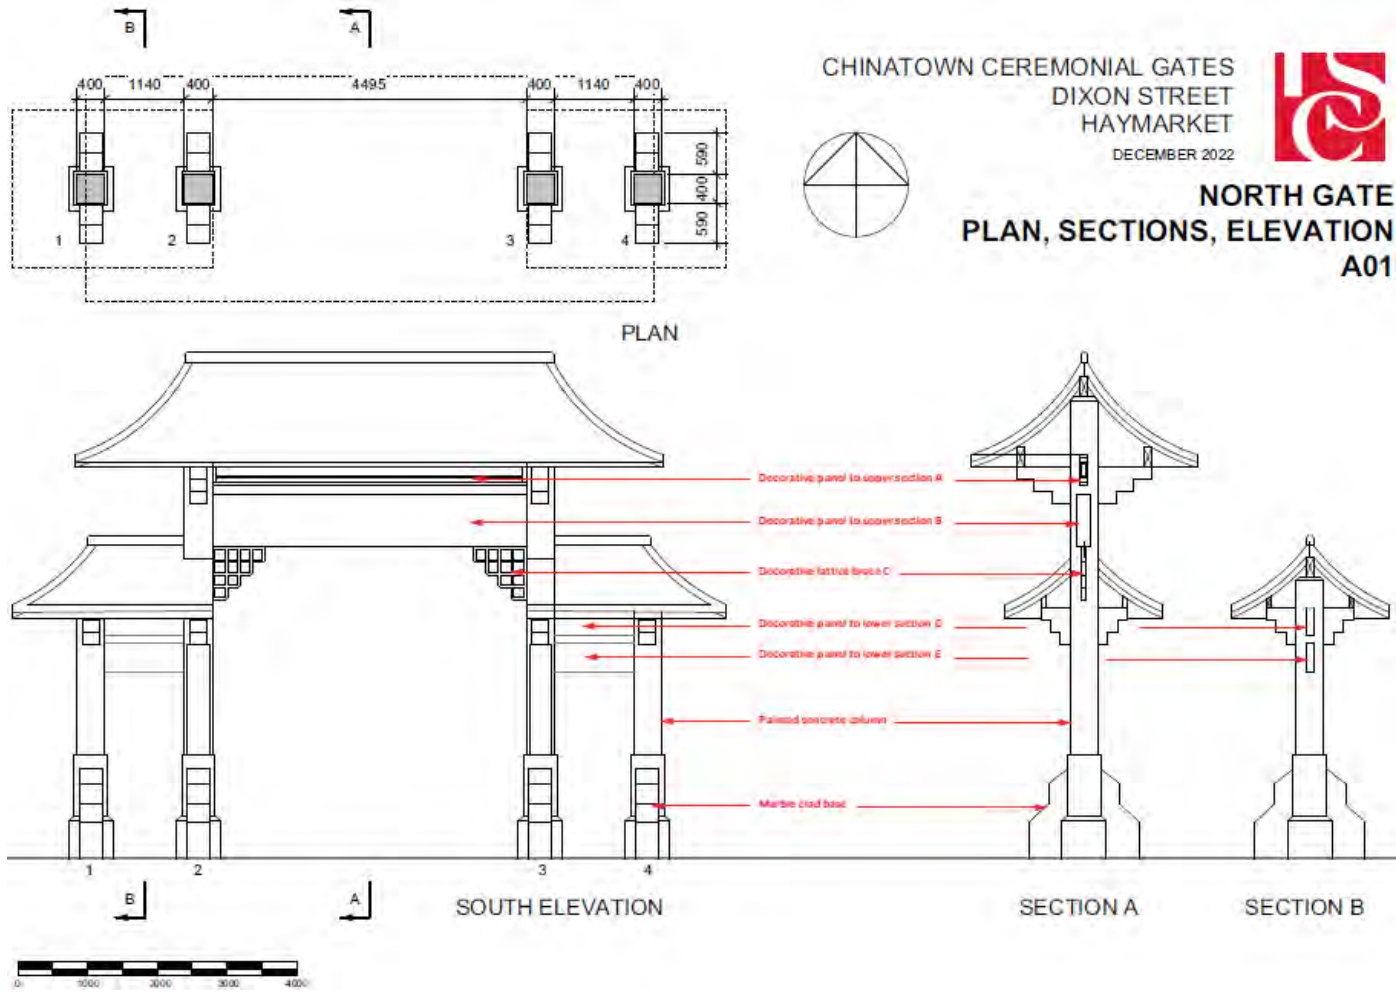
Elevation, Plan and Sections—Chinatown Ceremonial Gates Dixon Street, Haymarket, ICS dated December 2022.
